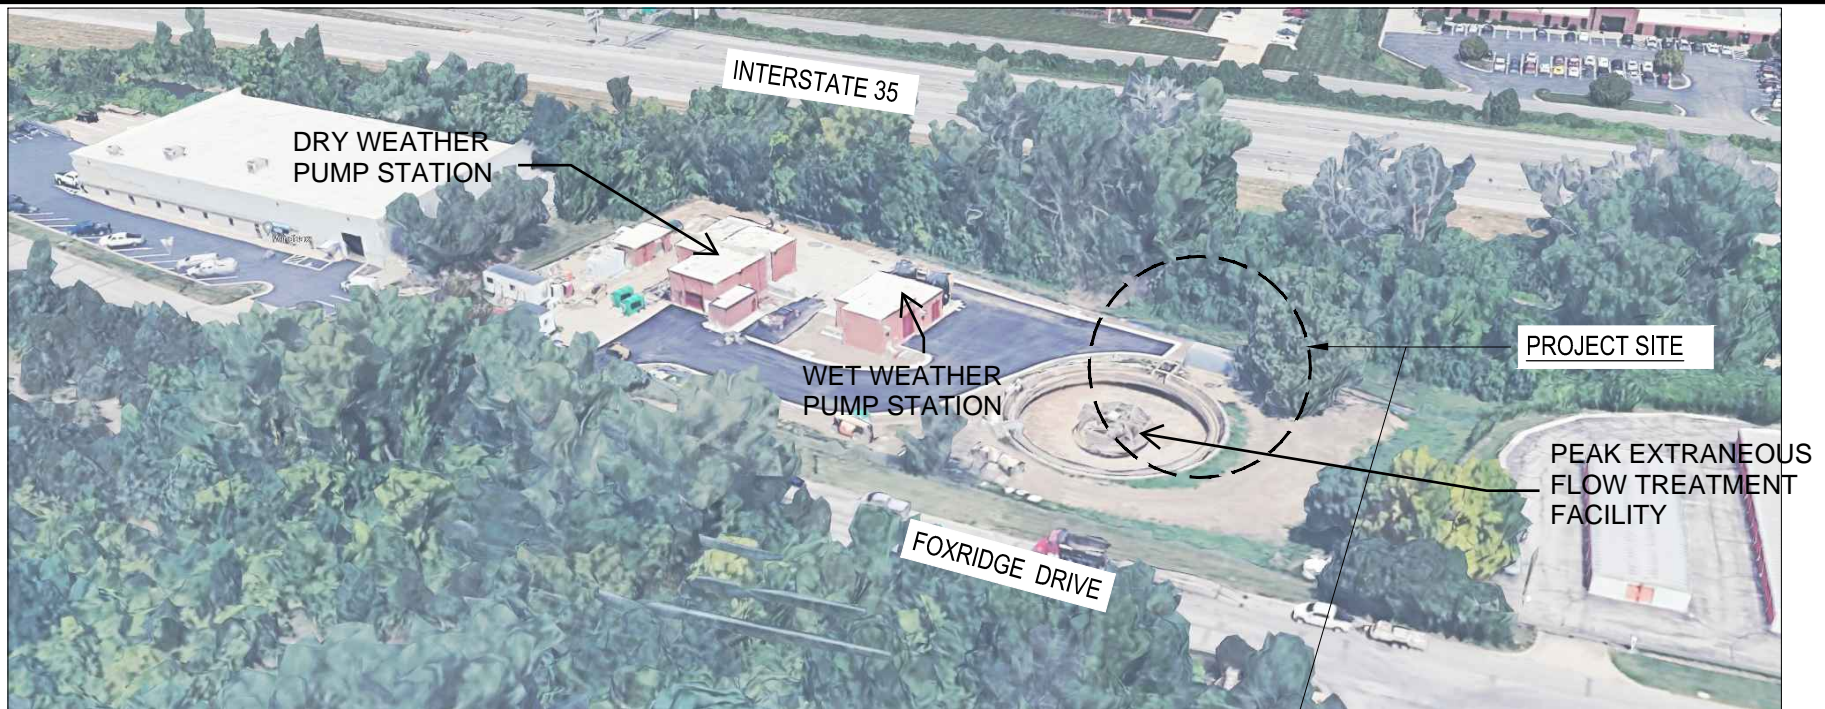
EXISTING SITE AERIAL AND STREET VIEW
